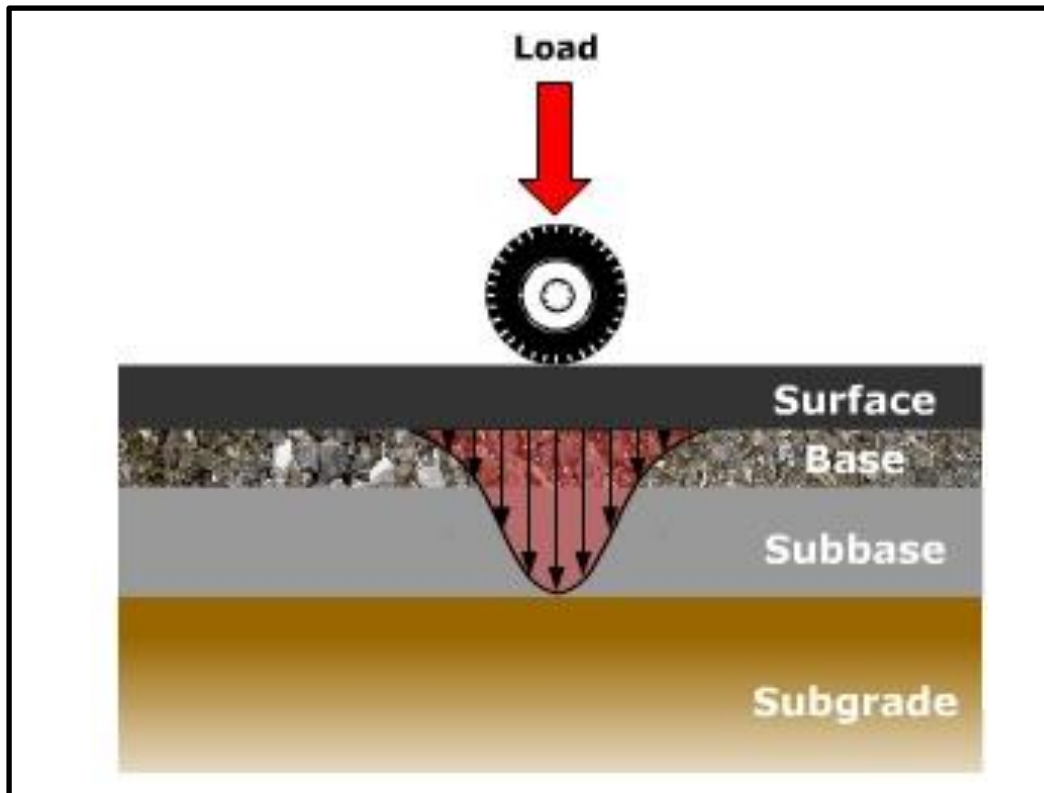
Distribution of load stresses in flexible pavements.[4]
